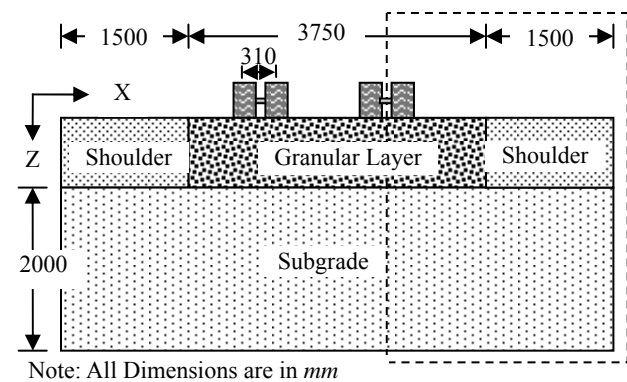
Sectional View of Pavement Considered for FE Analysis.
